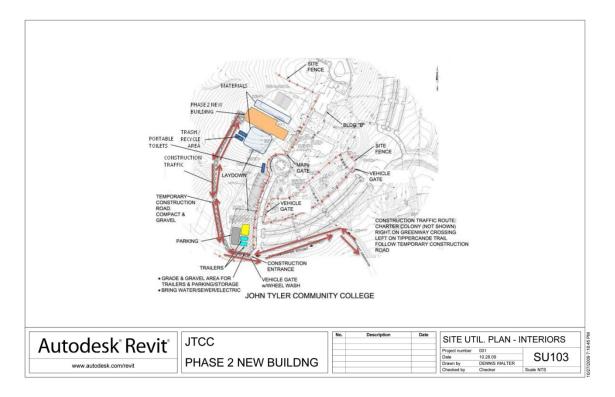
, Site Utilization Plan for Interiors Trades' Phase
